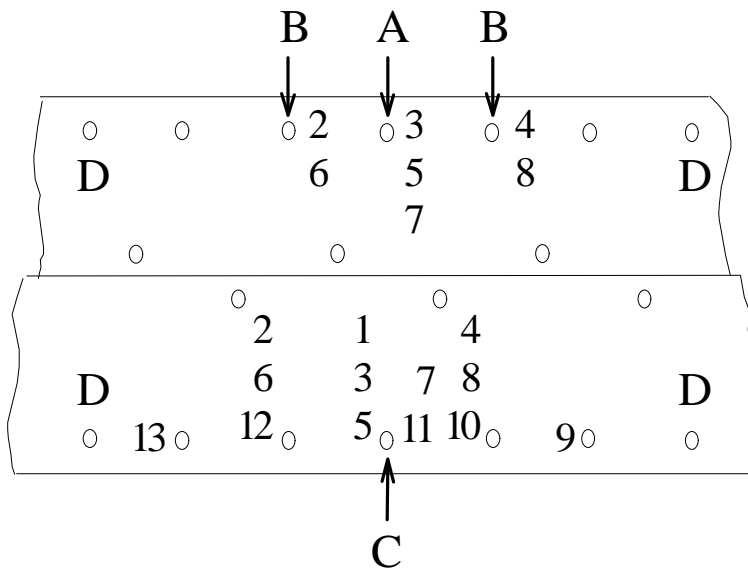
Location of holes and the order of grout pumping to correct settlement.
